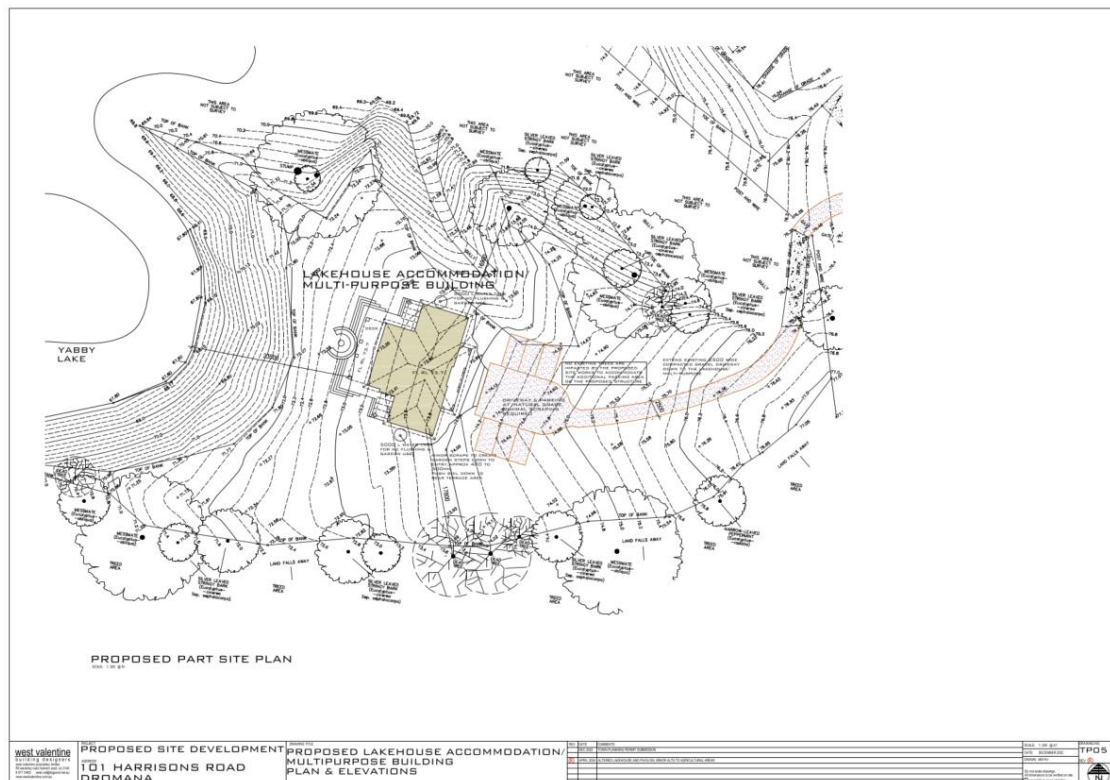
Location of proposed 'Lakehouse' (source: Development Plans 2024)
